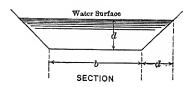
(Part 3 of 3).—Hydraulic Elements of Trapezoidal Sections.
